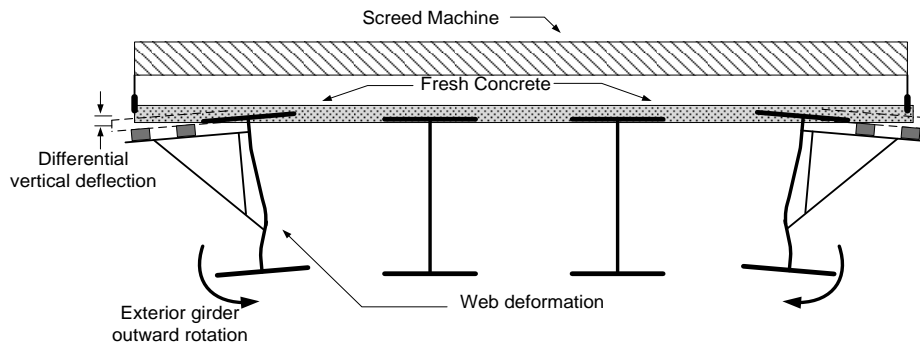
Exterior girder rotation due to unbalanced eccentric load on overhang deck
